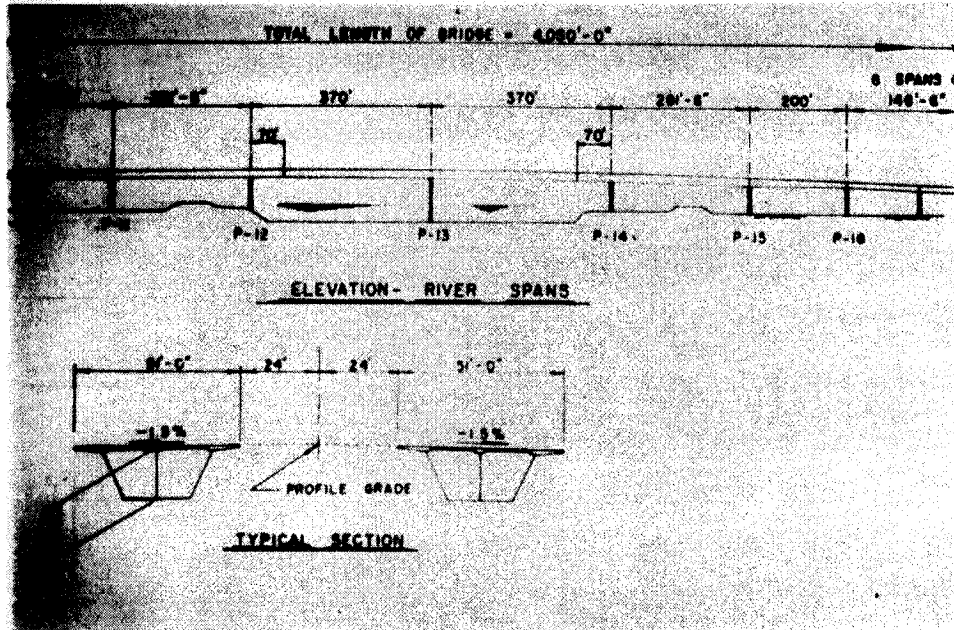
Sections and Elevation of 4050 ft. Long Structure
